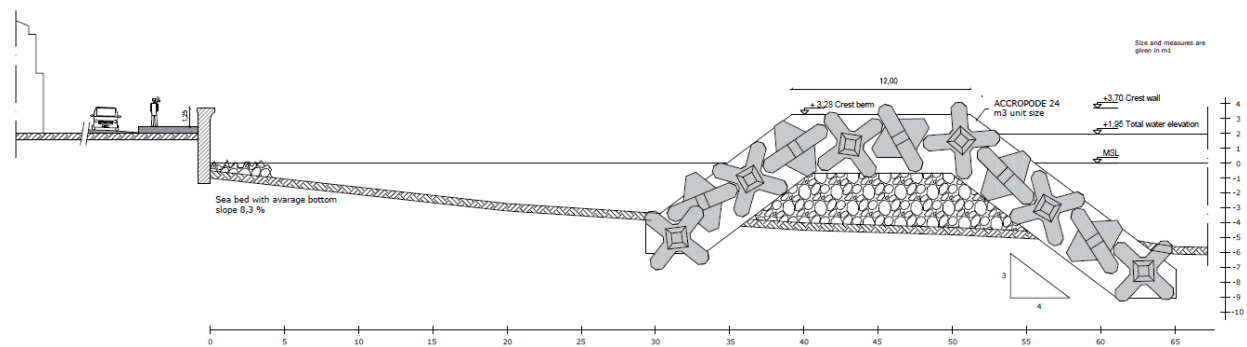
Detailed design for section 2.3, 2.4, 2.7 and 2.8
